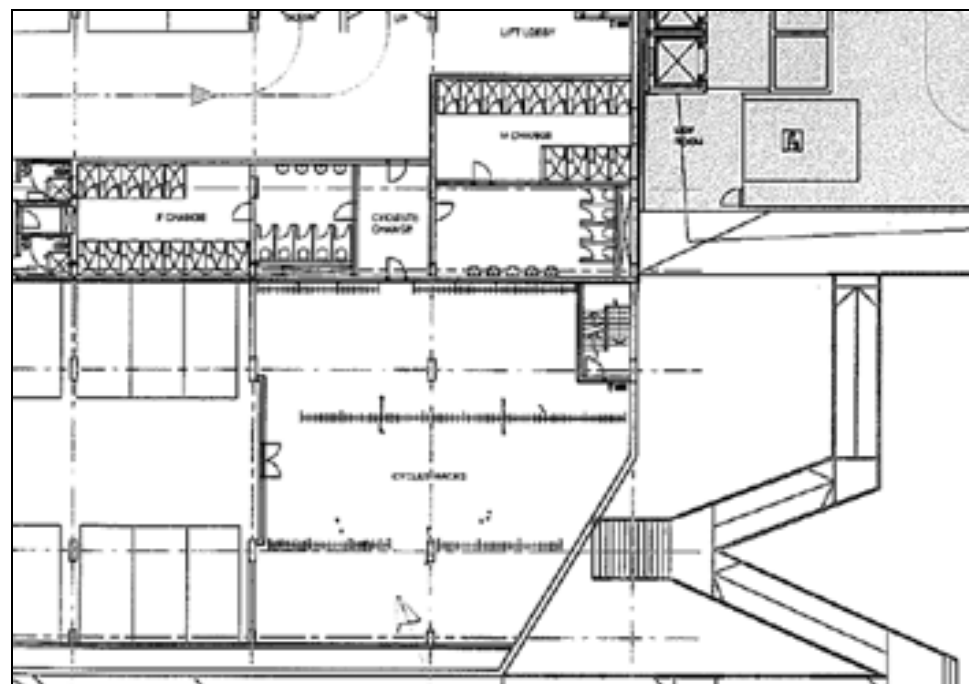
Cycle Parking / Shower Facilities in the Project Application
